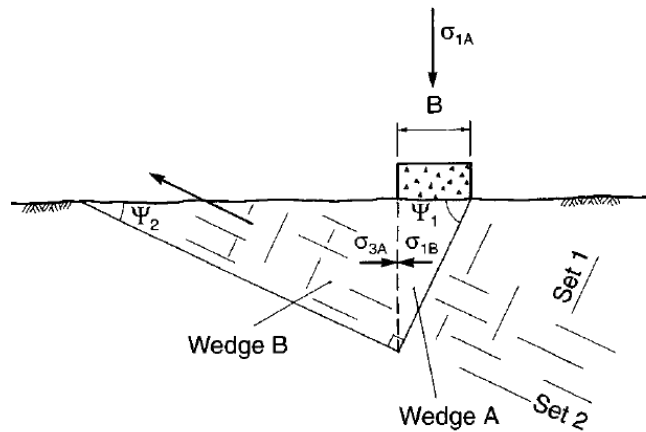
Foundation on rock containing inclined bedding planes and orthogonal joint sets [13]
